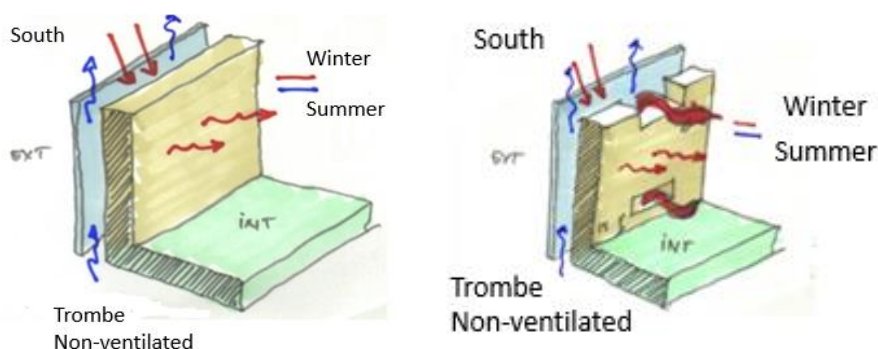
Sketches Ditoiu Nina-Cristina - ventilated / unventilated Trombe wall system, solar contribution by heating in winter and ventilation in summer, Trombe system The original wall with high thermal inertia is colored black to attract sunlight with a role in heating it<sup>12</sup>
